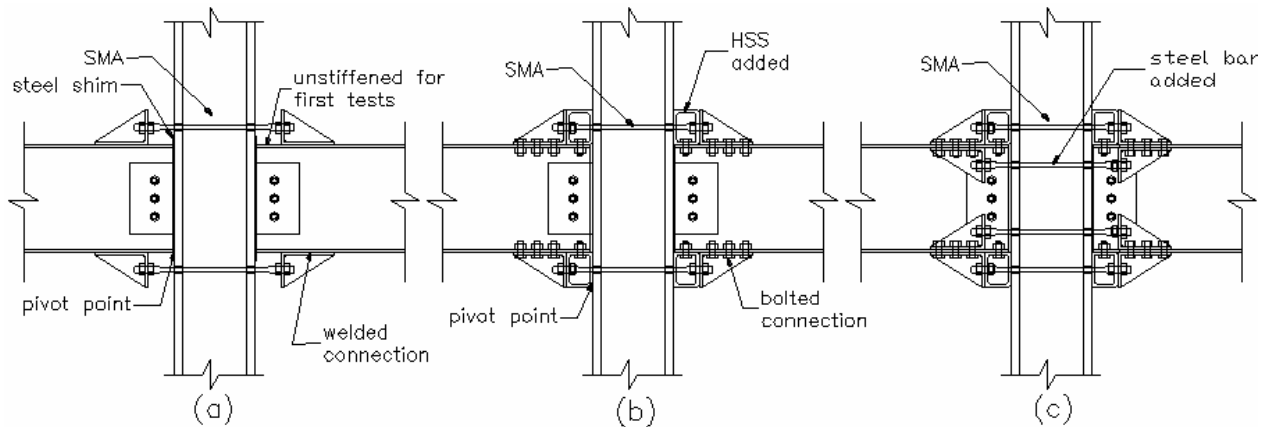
(a) Penar (2004) connection, (b) current connection, (c) proposed PARA connection
